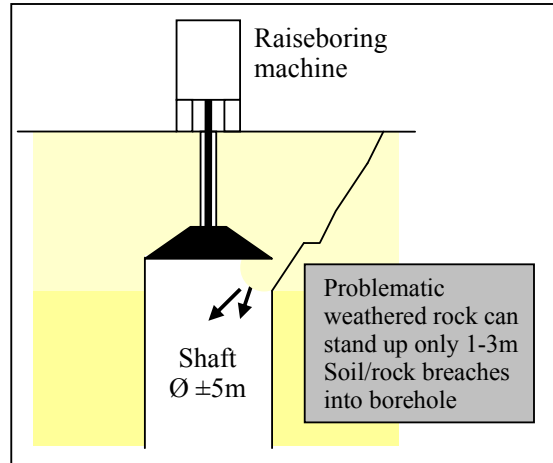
The problem of wall instability encountered in soft soil/rock due to fractures and weathering, during raiseboring.
